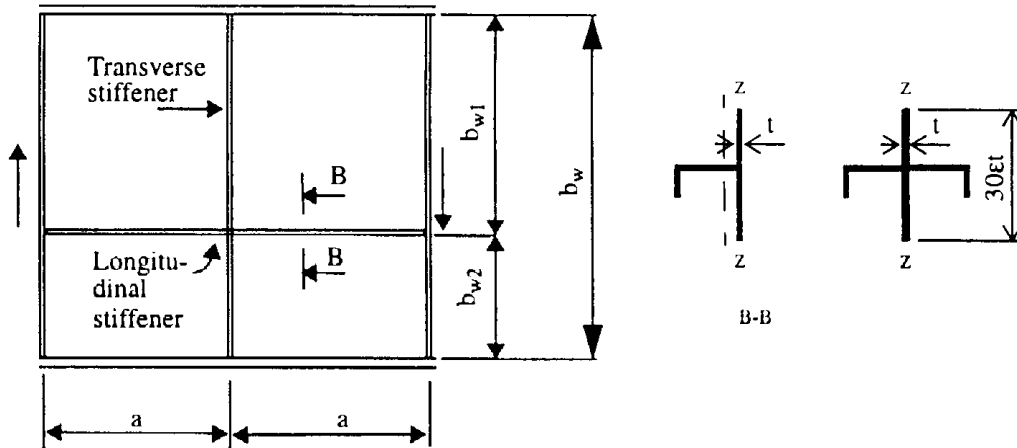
Web with transverse and longitudinal stiffeners. [Fig. 4.6]
